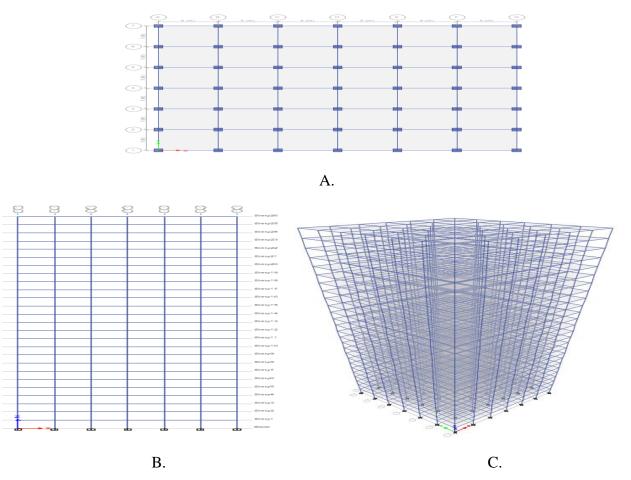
Moment Resisting Frame A. Plan View B. Elevation View C. 3D View
